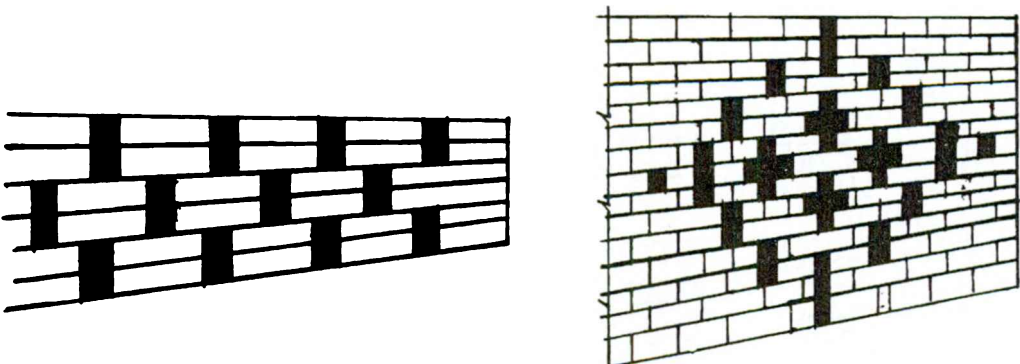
Jaliwork in brick masonry for ventilation used in low-cost housing instead of windows.
